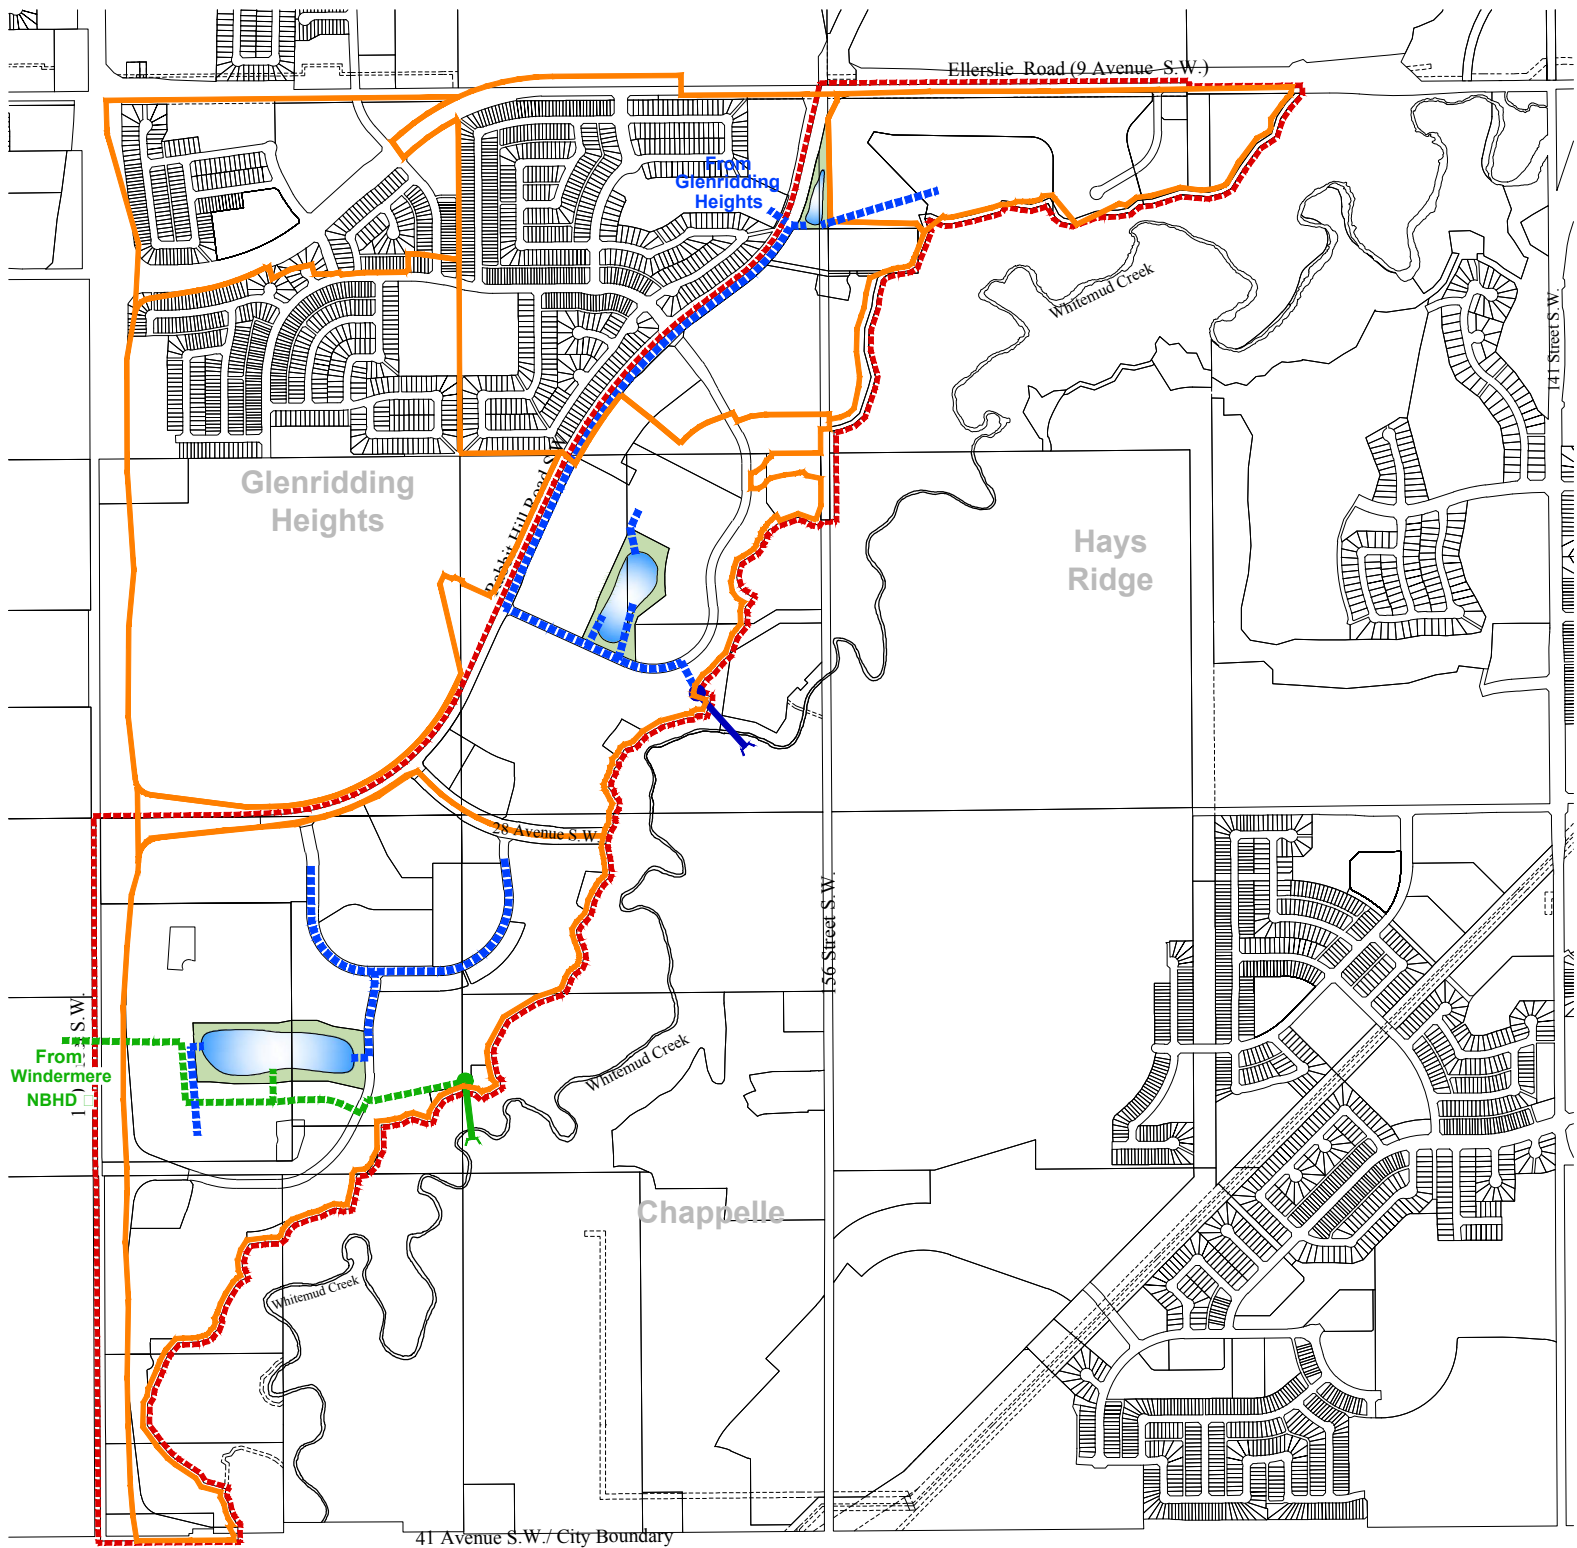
Sanitary Servicing Glenridding Ravine - Neighbourhood Structure Plan
